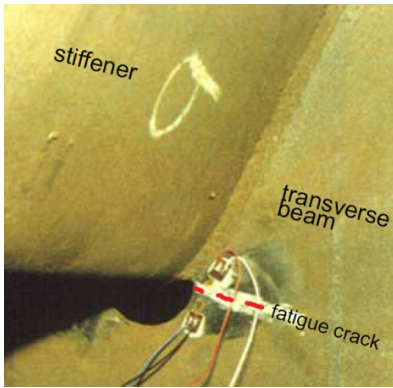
(a) Fatigue crack - Specimen A
